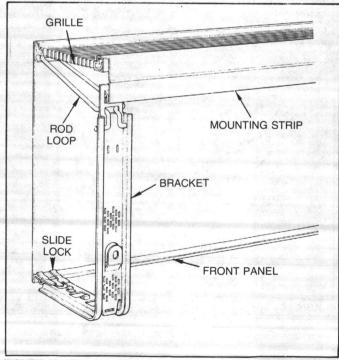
Type TA Enclosure Mounting Detail (View from Rear)
